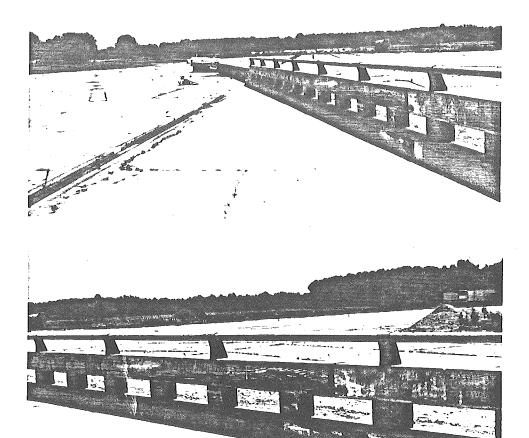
Posttest photographs of bridge rail system, test 1952-5-90.
